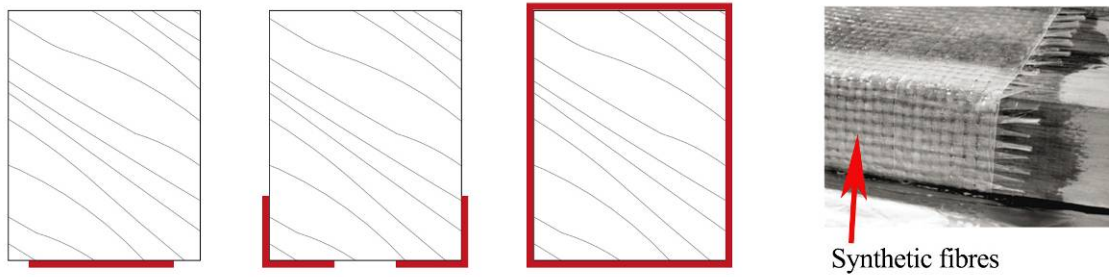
Position of fibre reinforced polymers on timber elements; Reinforced timber element detail [22]
